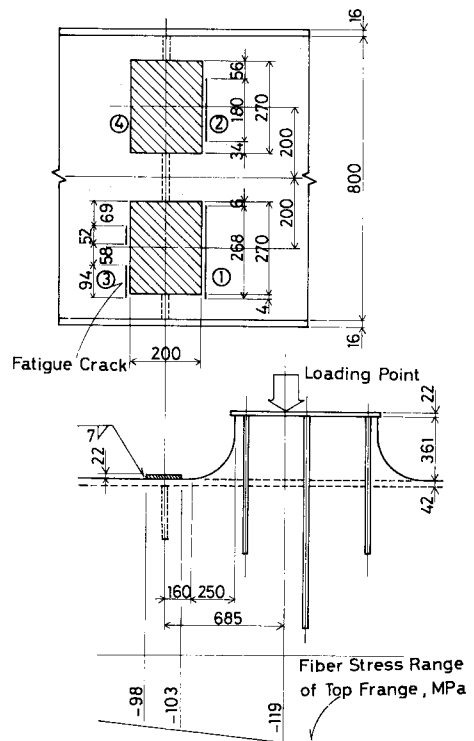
Fatigue cracks in fillet welds of bedplates.
